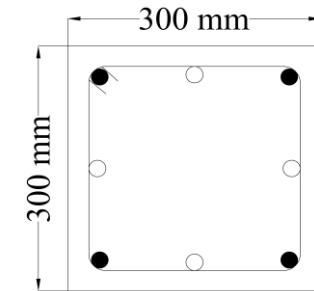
(c) shows the typical column reinforcement details. Each column contains a total of eight longitudinal bars, comprising four 20 mm diameter bars at the corners and four 16 mm diameter bars placed between them. Lateral ties of 10 mm diameter are provided at 100 mm spacing throughout the height of the column. All columns extend continuously from the foundation to the top story to ensure vertical load transfer and moment continuity. Figure 3.4(d) details the beam reinforcement layout. Each beam contains three 16 mm diameter longitudinal bars at the top and two 16 mm diameter bars at the bottom, ensuring flexural capacity under seismic loading. 10 mm diameter stirrups are provided at 150 mm spacing to resist shear forces. A 25 mm clear cover is maintained from the outer faces of the beam and column to the reinforcement on all sides to ensure adequate protection against corrosion and fire.
